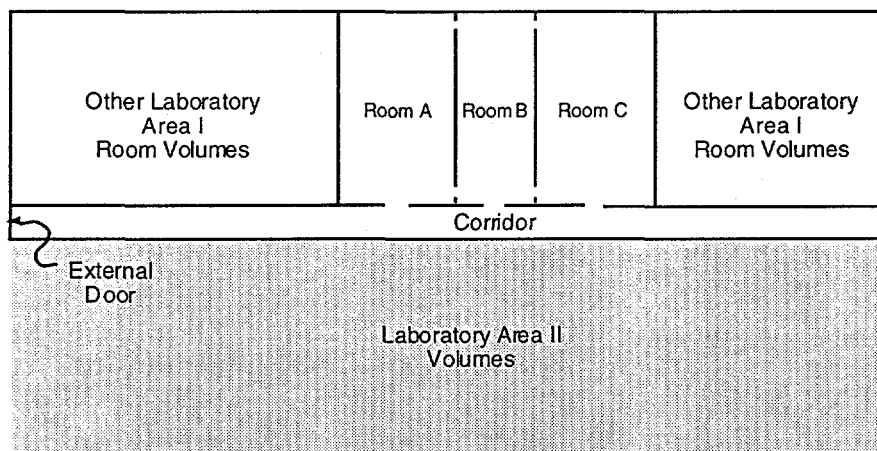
Simplified floor plan of Laboratory Areas I and II, showing locations of the fire room, Room B, the corridor, and the external door.
